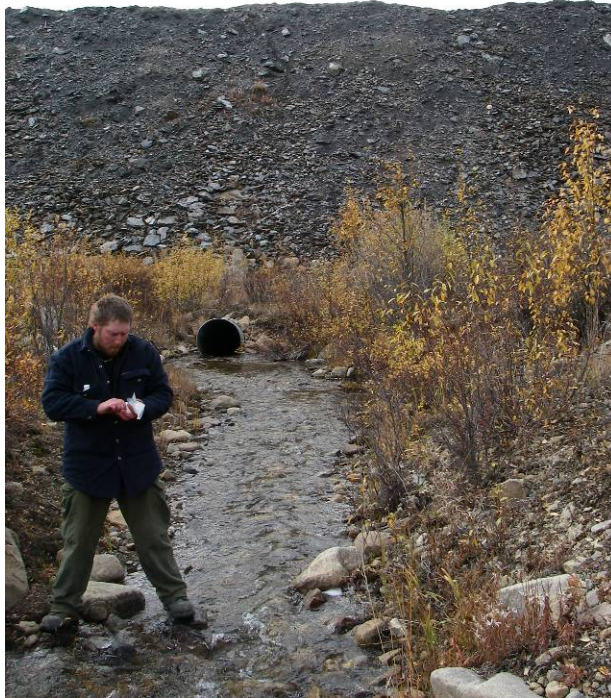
Corrugated pipe at inlet to HR-5 (Sept. 16, 2007).
